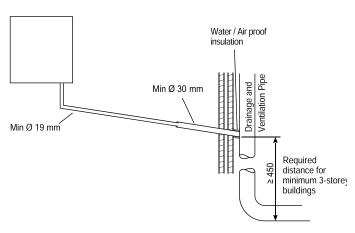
Connection of Condensate Drainage to Drainage and Ventilation Pipe
